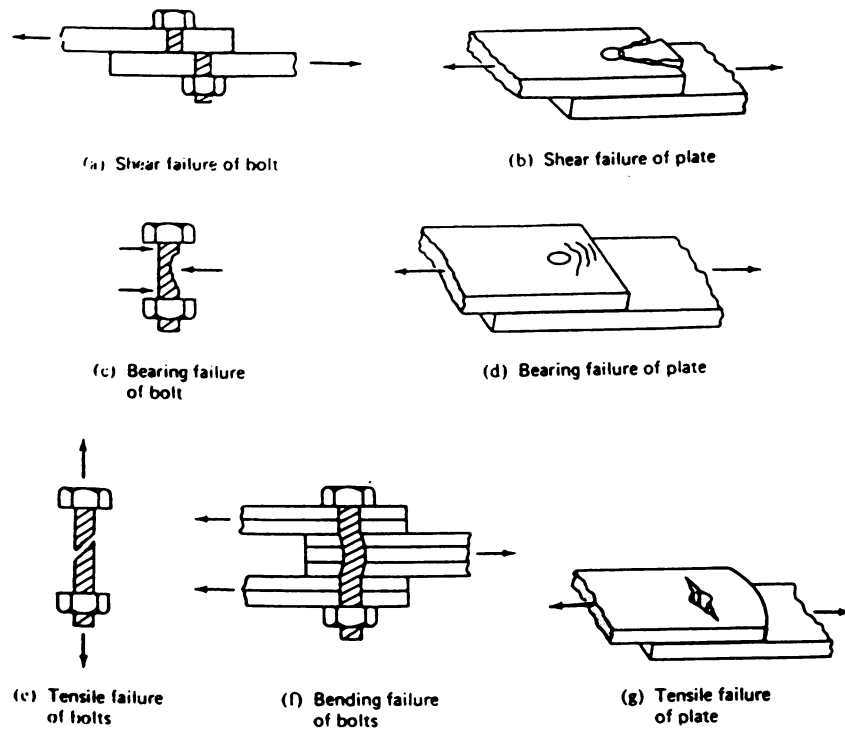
Possible Failure Modes of Bolted Connections ⁵⁶
